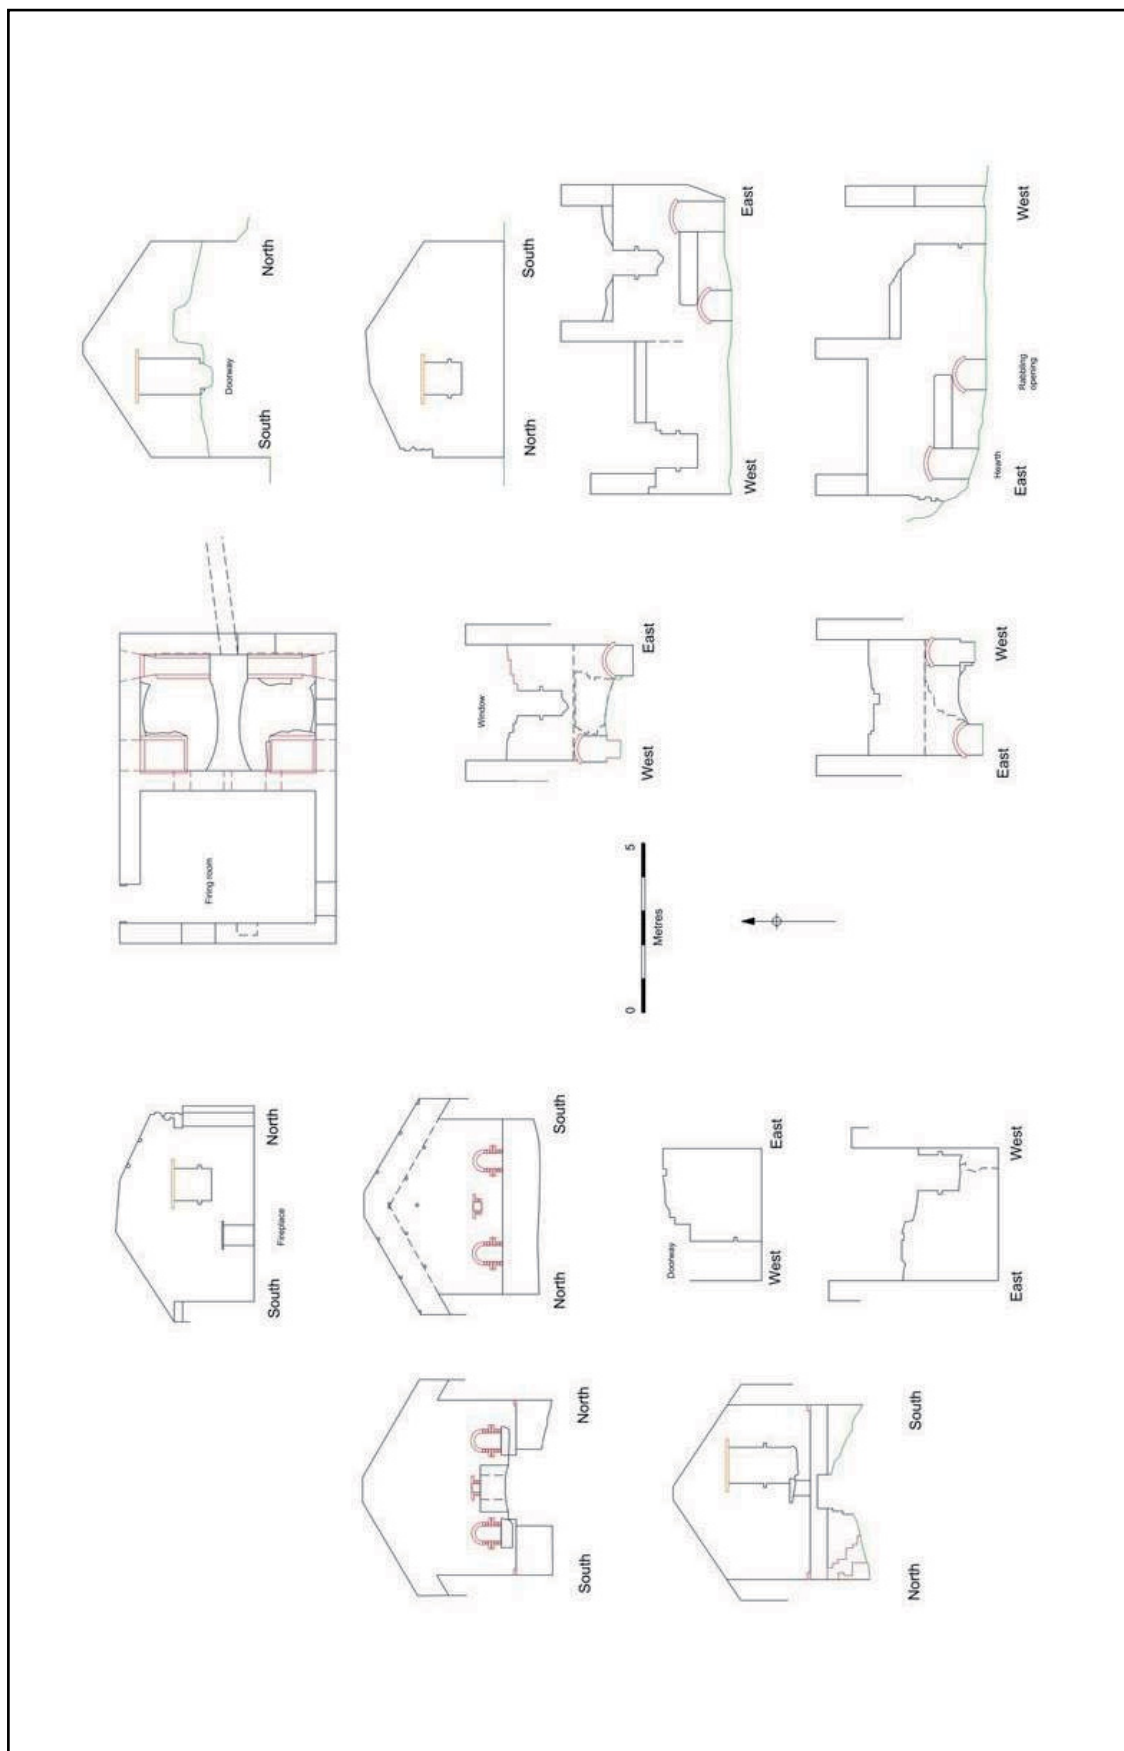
Plan, external and internal elevations of the Wheal Coates calciner [190346].
